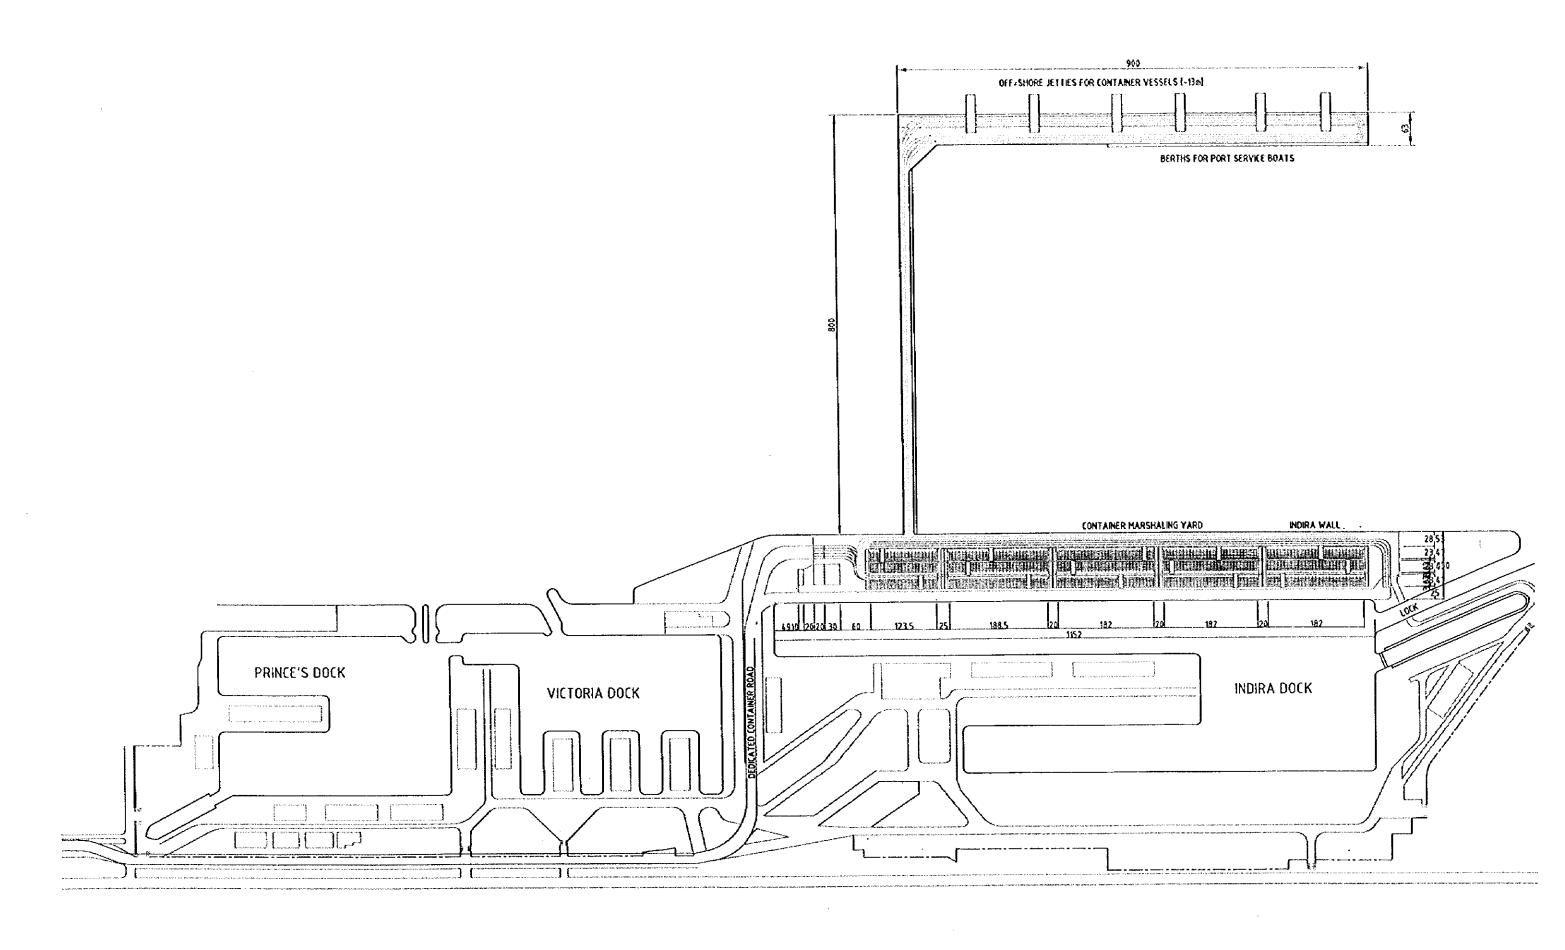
(2) LAYOUT PLAN OF A NEW CONTAINER TERMINAL AT INDIRA HARBOUR WEALL (ALTERNATIVE-3) SCALE 1:7,000
